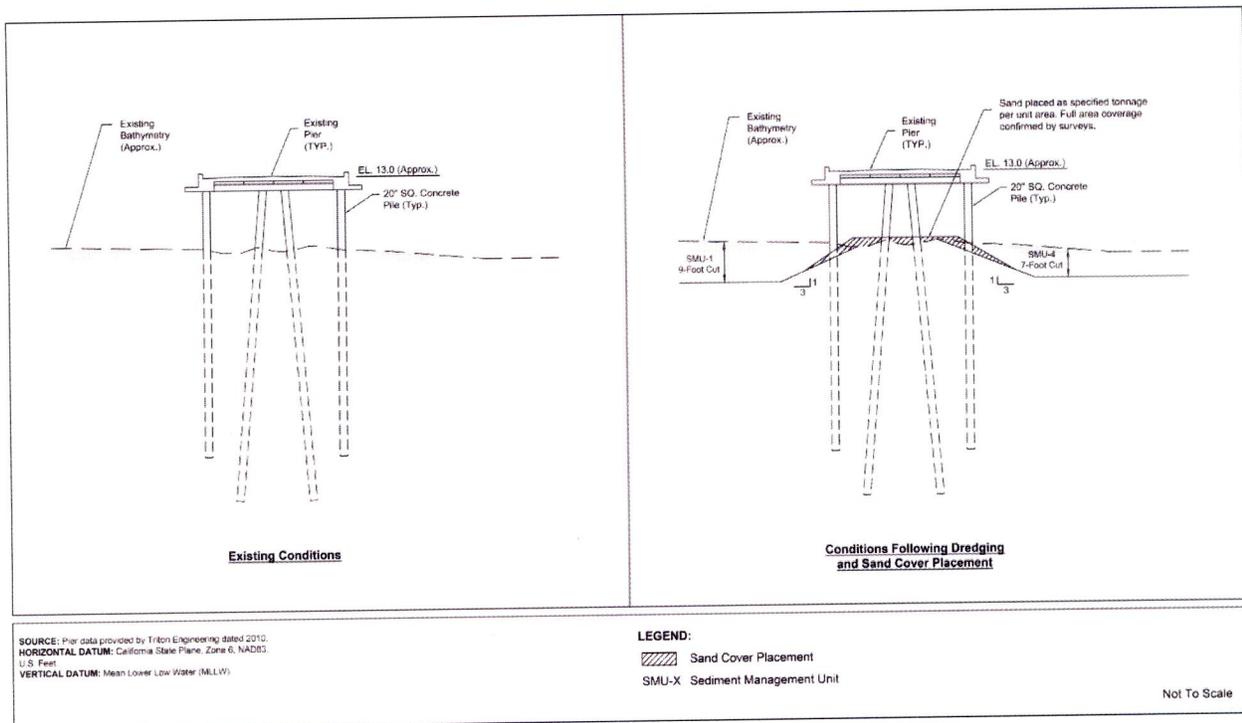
Typical Underpier Sand Cover Placement Cross-Section
